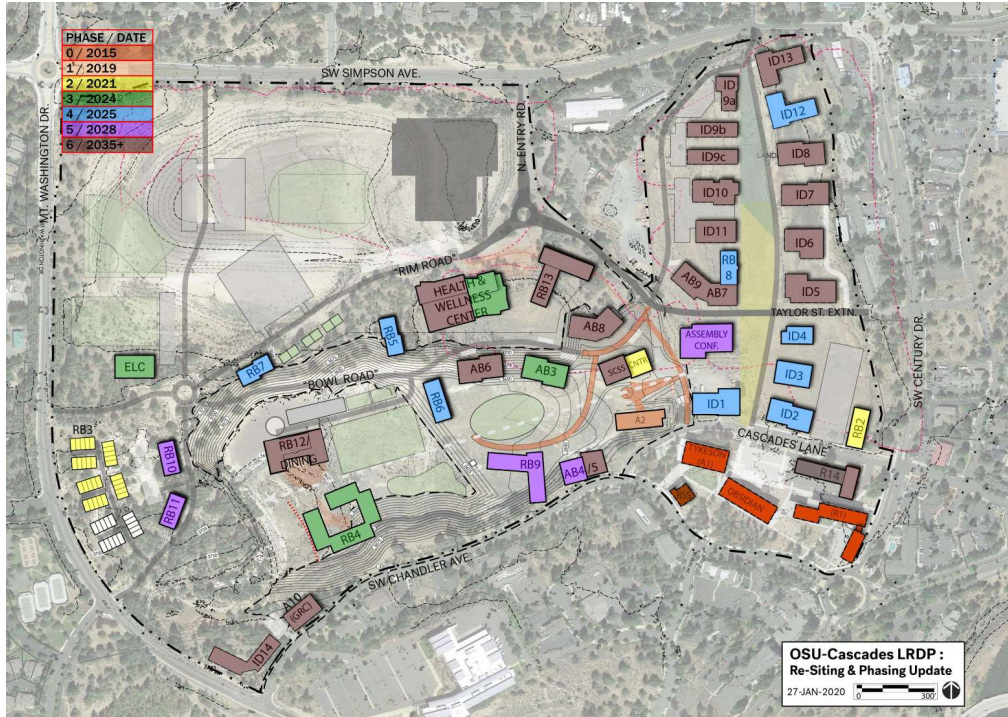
Campus Phasing Plan (March 2020)
